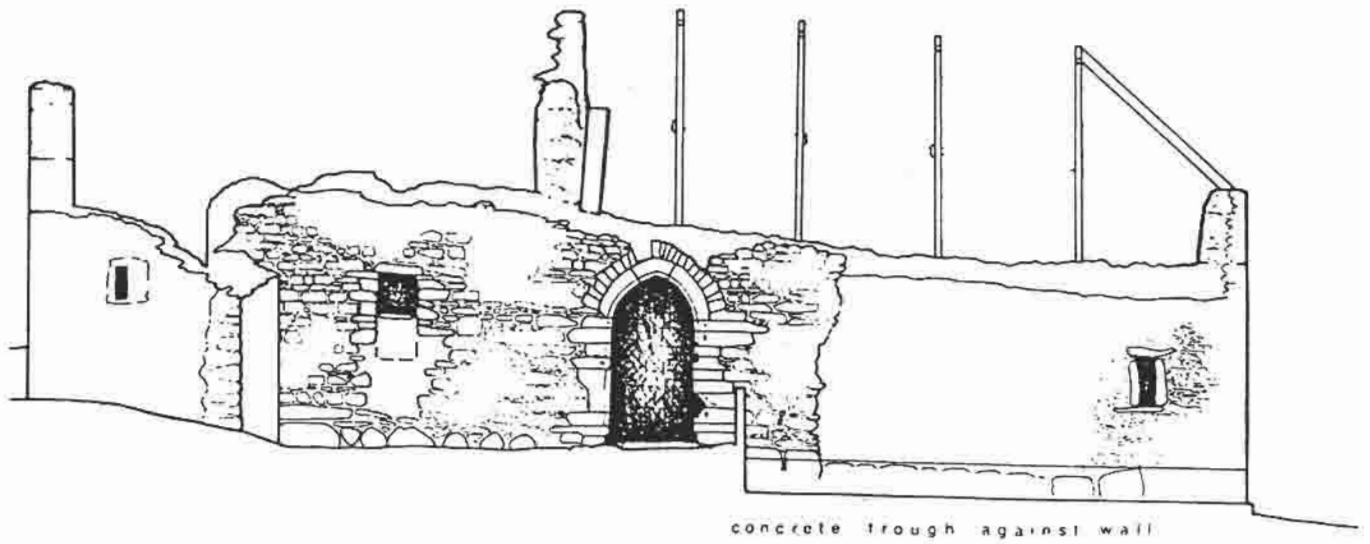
Lower Chaddlehanger, Longhouse; front north elevation.
